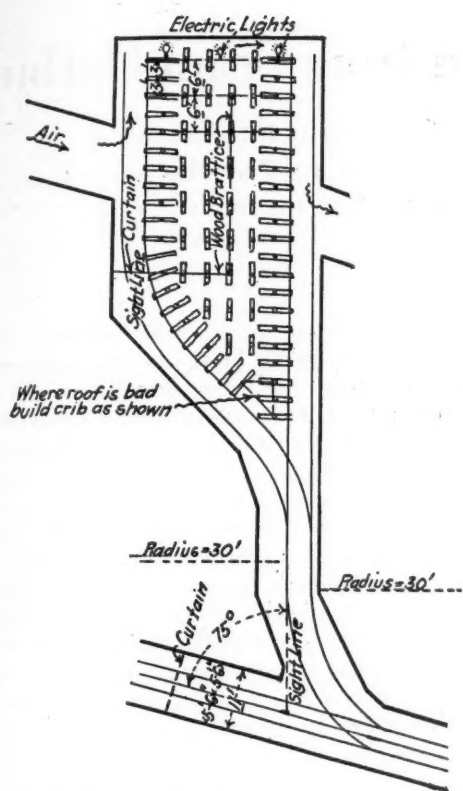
STANDARD TIMBERING FOR TWO-TRACK ROOM
